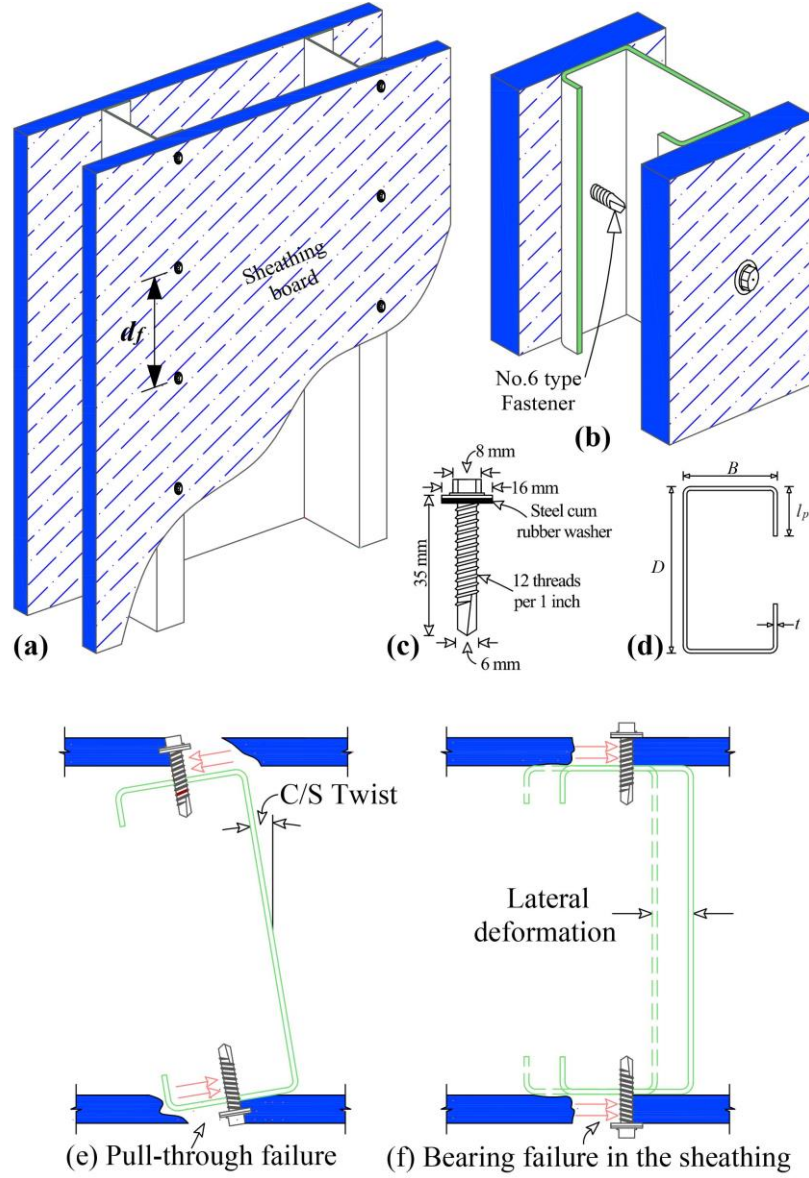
(a) Sheathing board in CFS wall panels; (b) Sheathing fastener connection; (c) Self-drilling fastener (No.6 Type) with steel cum rubber washer; (d) C shaped CFS stud (with notations); (e) Pull-through failure of self-drilling fastener at sheathing-fastener connections; (f) Bearing failure of sheathing at sheathing-fastener connections
